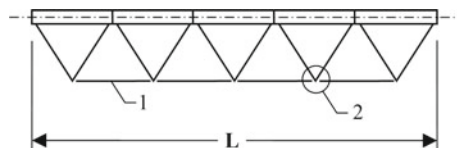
The possible way to improve the composite steel and concrete grid structure by removing the flange bolted connection: 1—the element of the bottom layer; 2—the proposed way of bottom layer members joints arrangement
